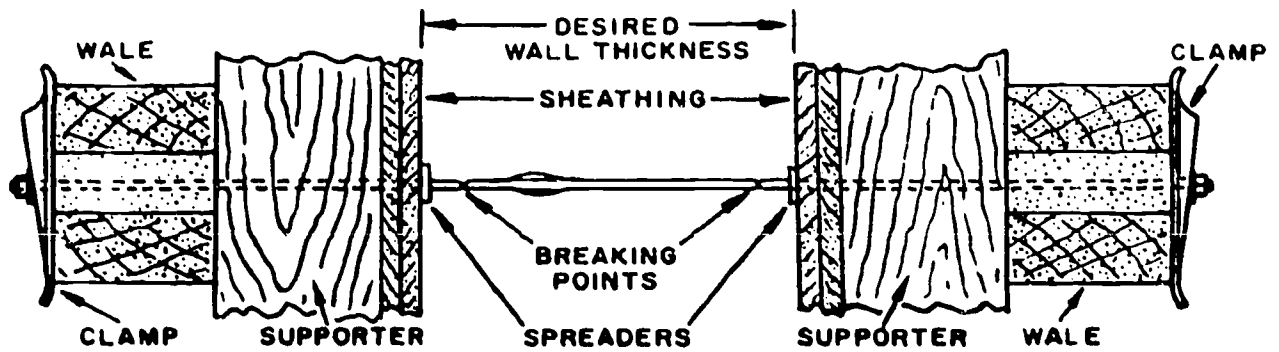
A Typical Wall Form Tie (Snap-Tie)
